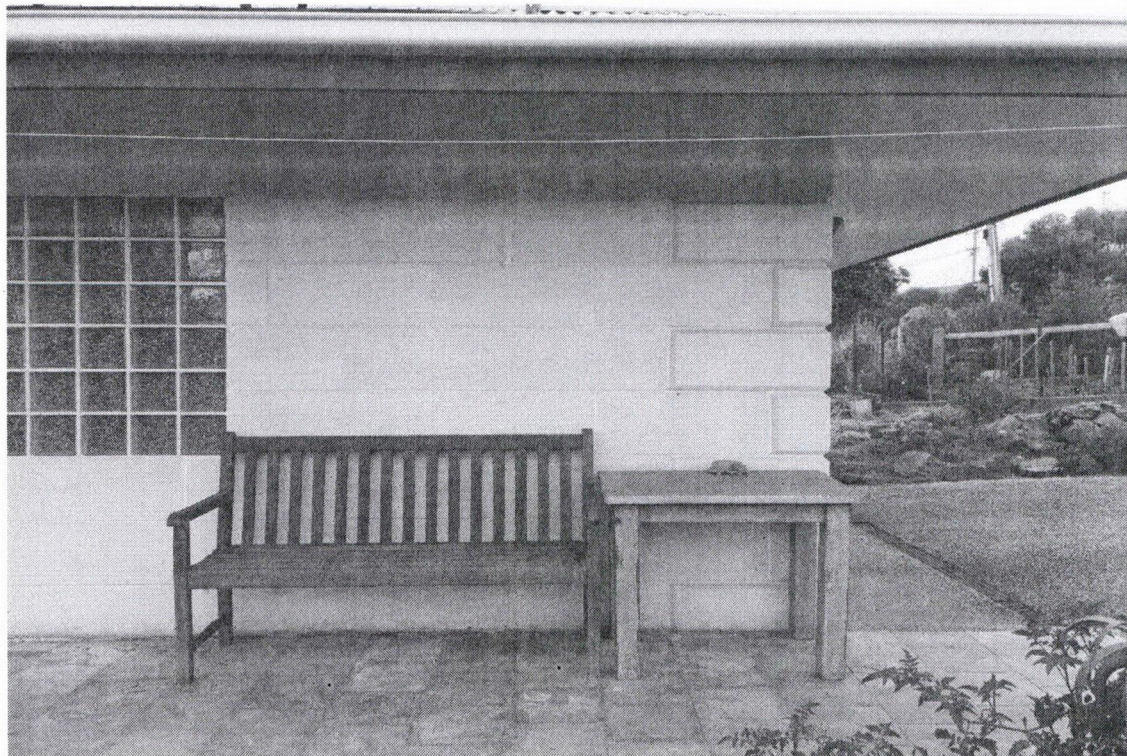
Evidence of cracking, potentially resulting from creep movements.
